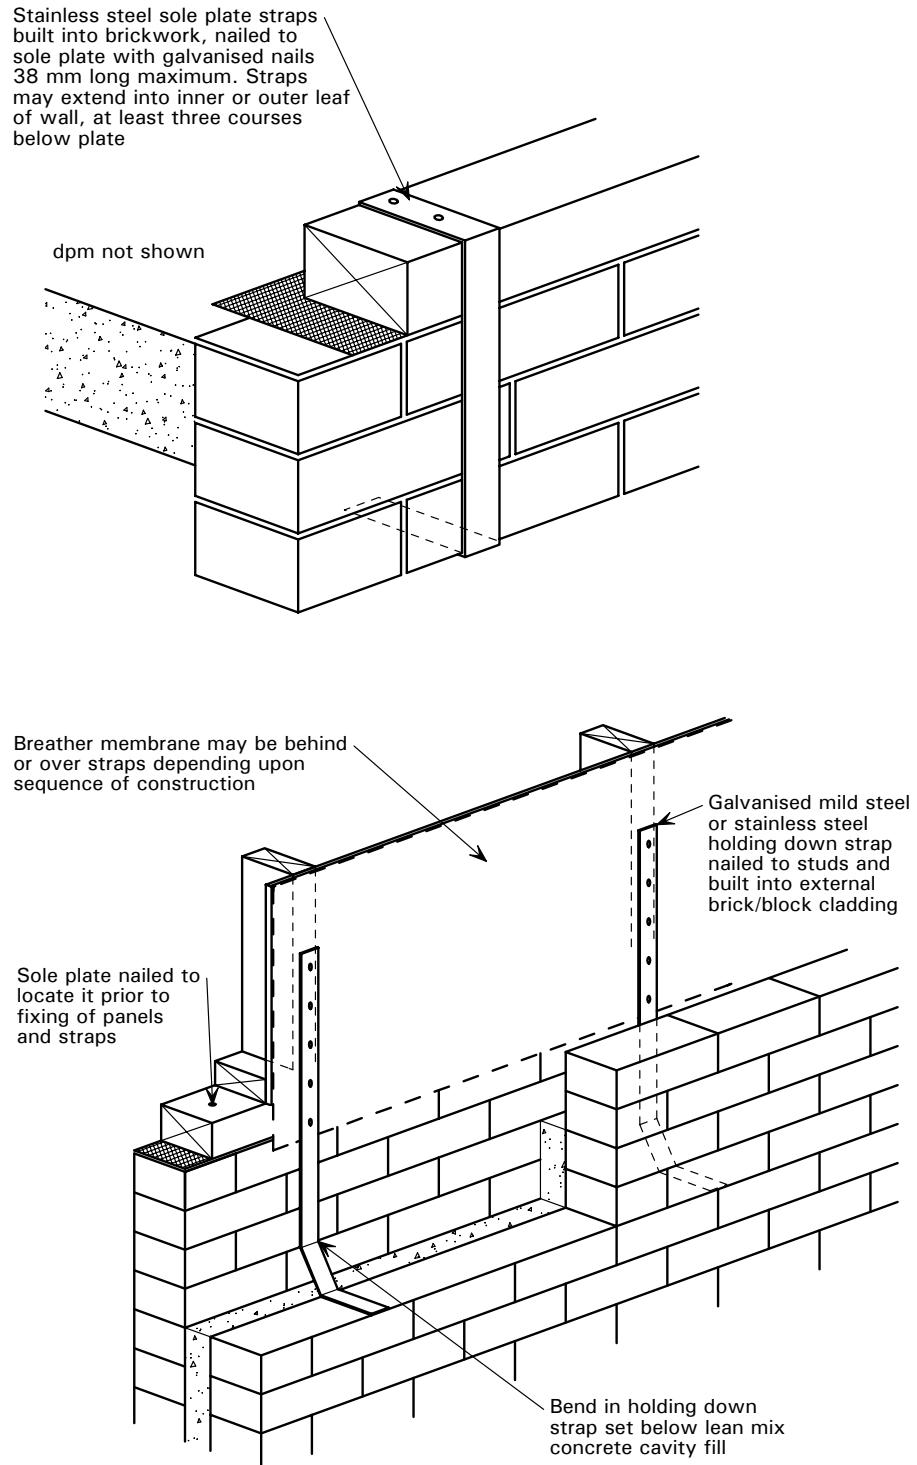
Stainless steel straps to secure sole plates and studs of timber wall frames (courtesy of TRADA Timber Frame Construction)
